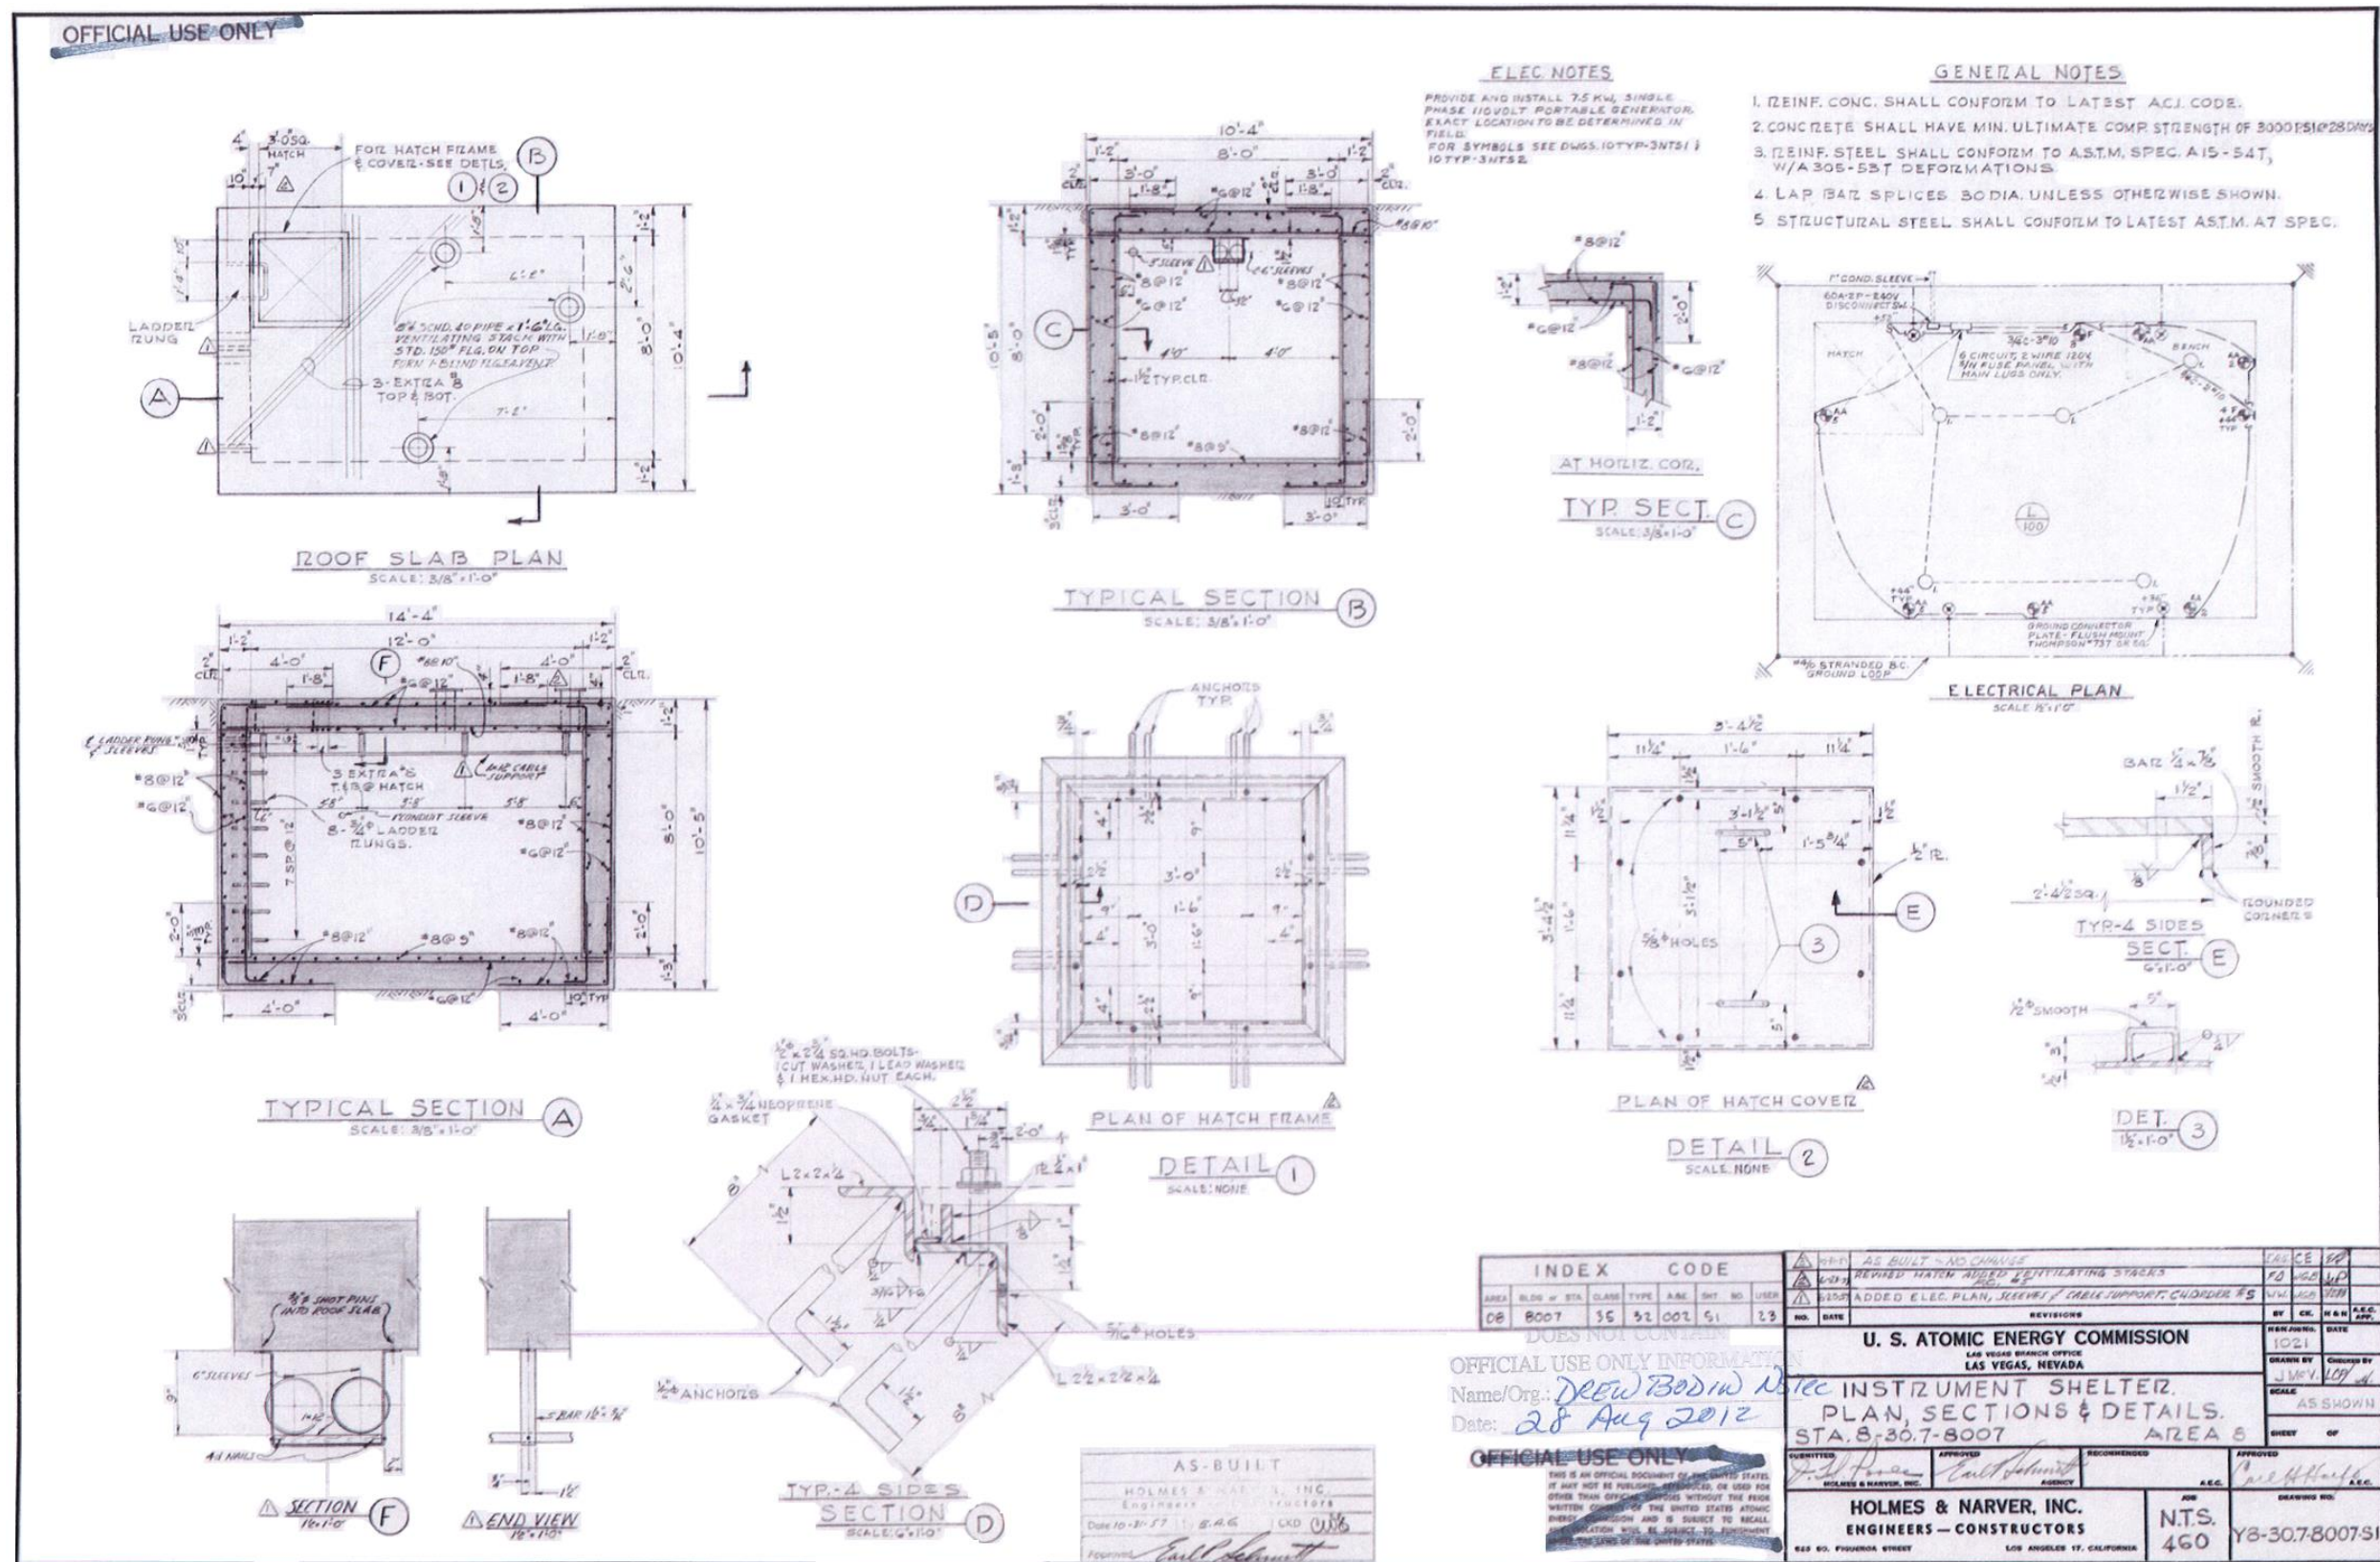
S919, Ballistic Research Laboratory instrument shelter, plan, sections, and details.
